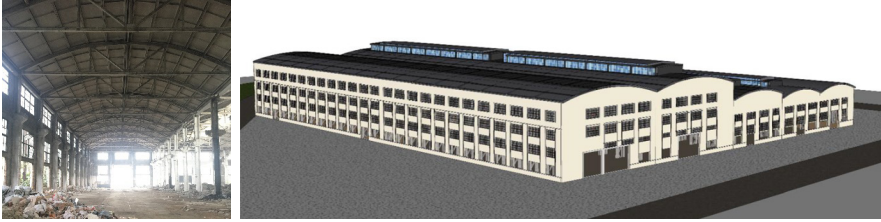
Interior view of the Heavy Industry Workshop, Pengpu Machine Factory
